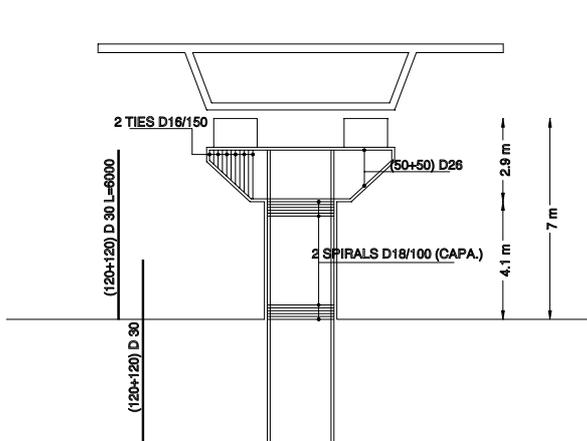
EC8 irregular bridge central pier: rebars arrangement (mm)
